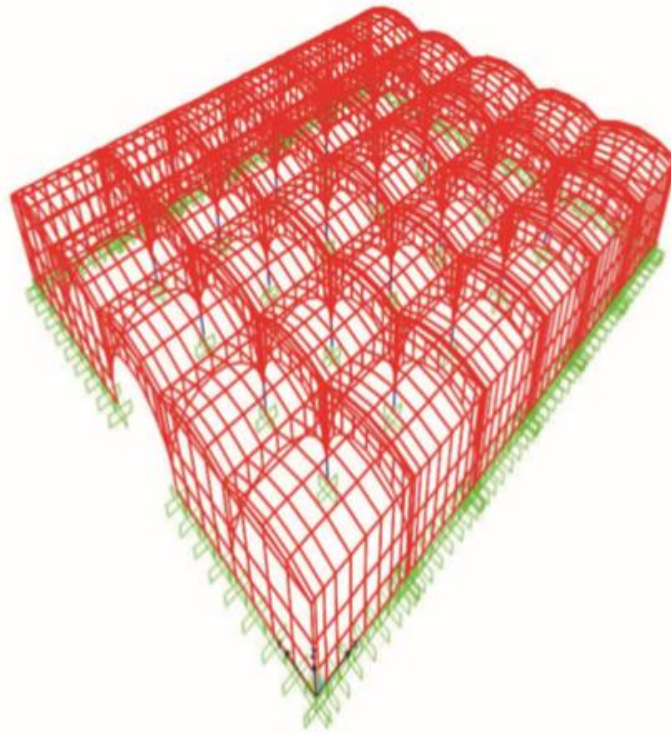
Three dimensional model of Çardak caravanserai including structural elements
